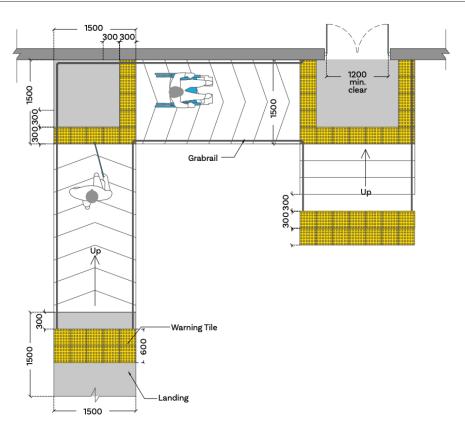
Typical details of 'L' Shaped ramp with steps: Type A (in mm) Source: https://niua.in/intranet/sites/default/files/2262.pdf
